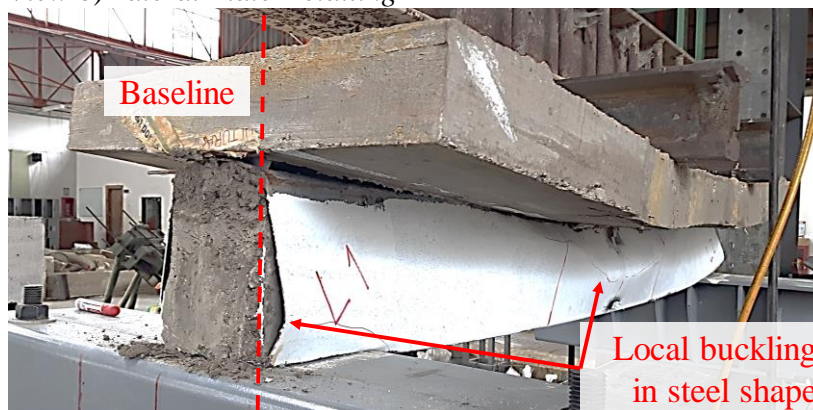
Concrete Slab Fracture in Full-Scale Beam Test a) General View
